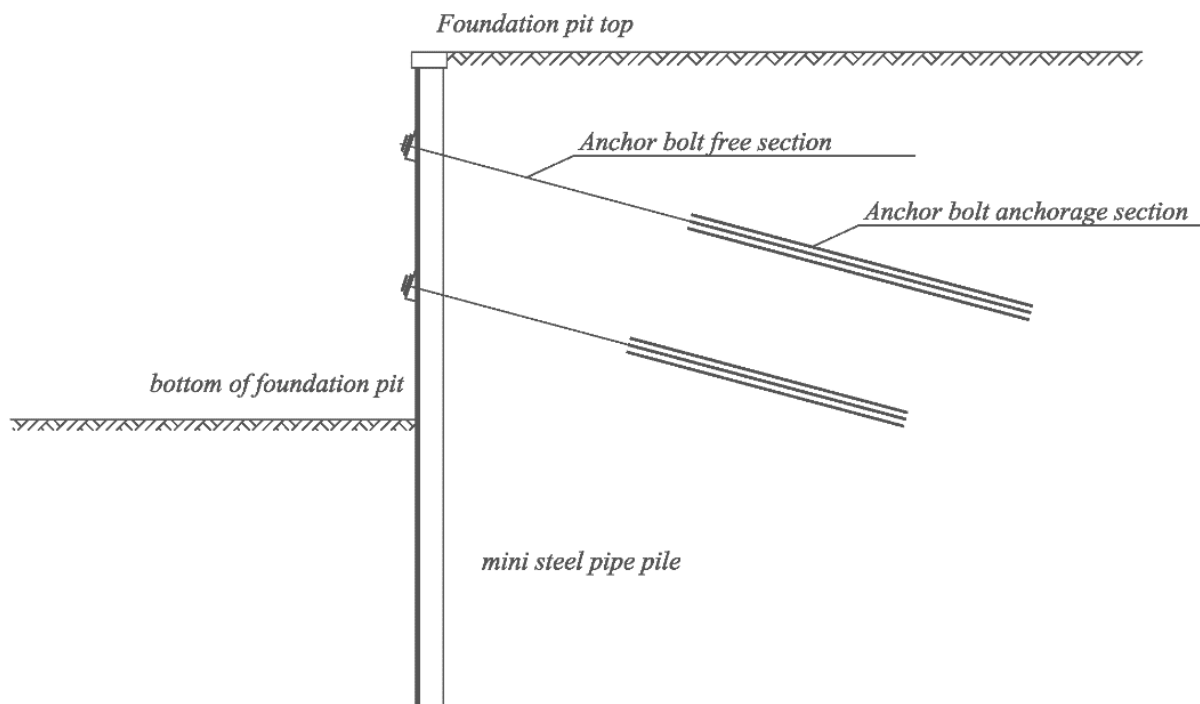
Prestressed anchor cable micro steel pipe pile supporting structure diagram
